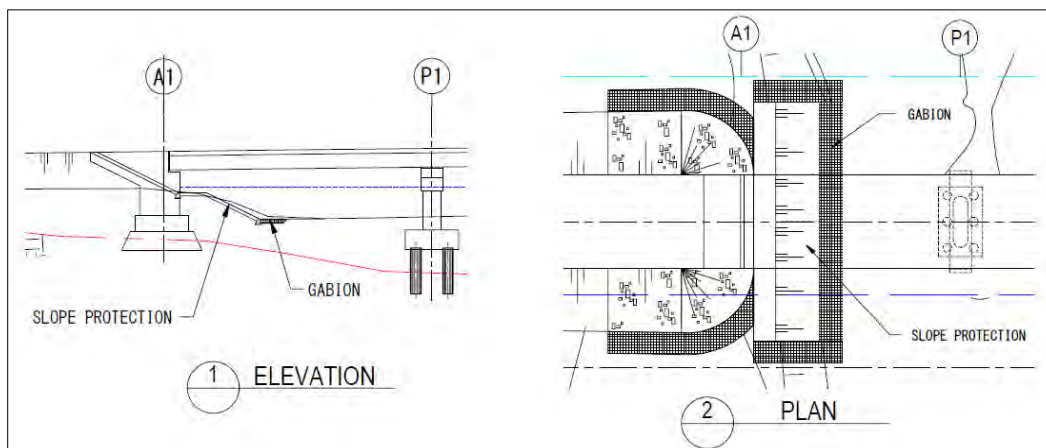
Protection Plan under the Abutment Cross-Section
